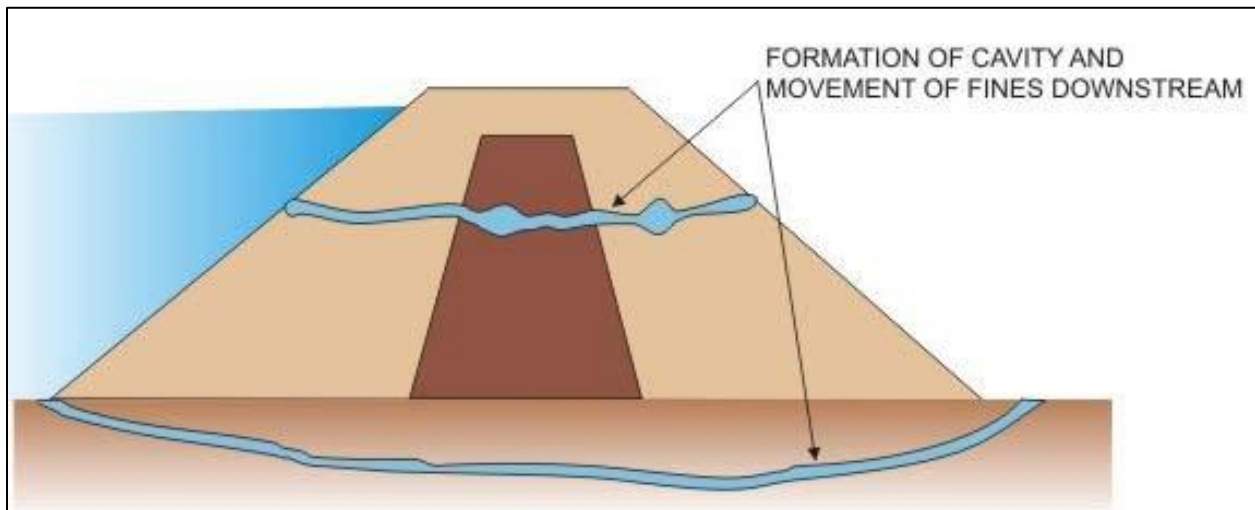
Internal erosion (also called piping) is a common mechanism of tailings dam failure. Internal erosion occurs when the seepage of water through the dam or its foundation is fast enough to entrain fine particles, which can lead to a loss of structural integrity, followed by a breach of the dam. Figure from Bentaher (2012).
